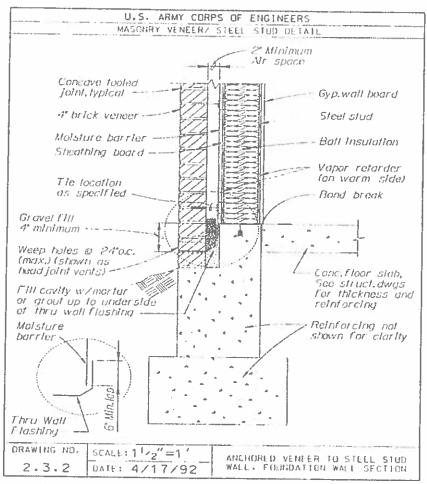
Mosonry Veneer Steel Stud Panel Wall, Foundation Wall Section
